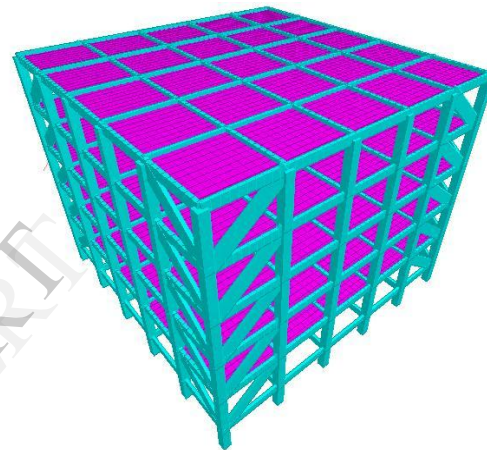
Model of Conventional building with Masonry Infill Wall
